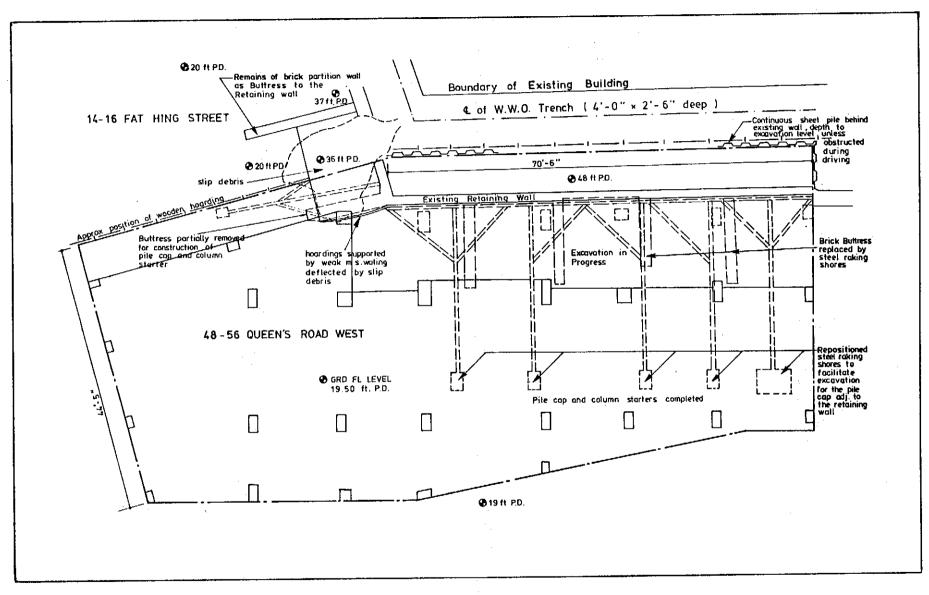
Retaining Wall at Fat Hing Street - Approximate Extent of the Failed Wall and the Temporary Shorings on the Adjacent Site
